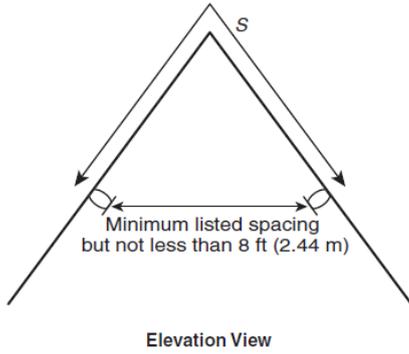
(a) Minimum Distance Between Sprinklers with Sloped Ceilings — Arrangement A.
